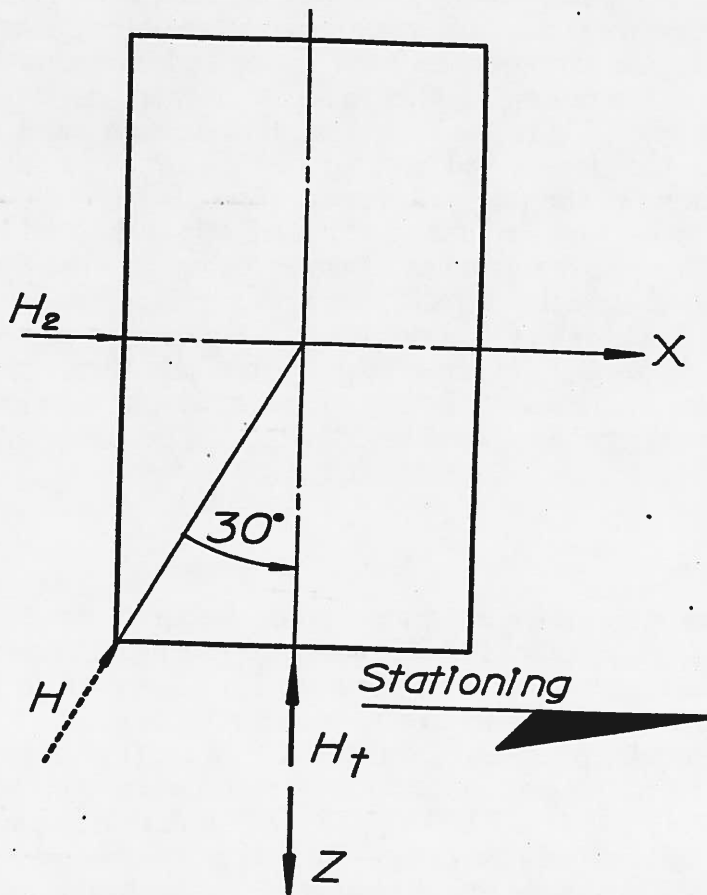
Plan View of Pier Footing under Skew 30° Ship Impact
